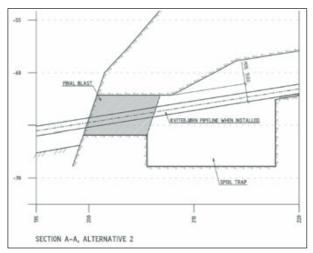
Alternative 2 - section view of preliminary underwater piercing blast round. (Illustration: Norconsult)
